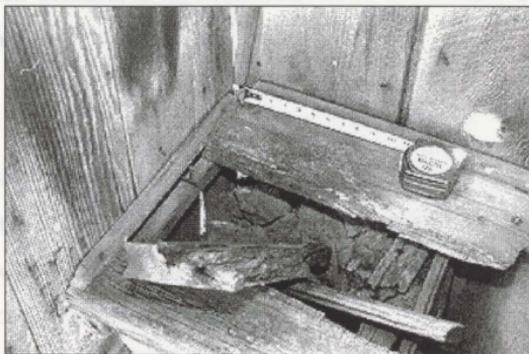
Outhouse, Detail Showing the Toilet Seat and Ballast.
